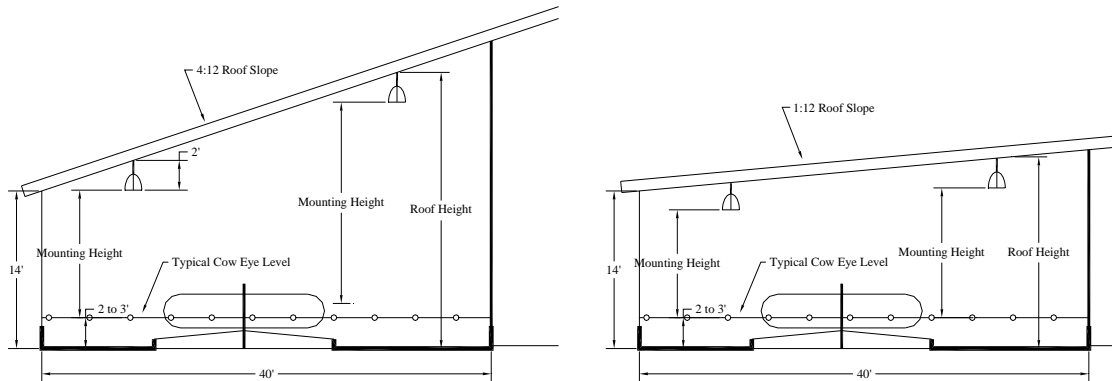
Impact of Roof Slope on Mounting Height in Dairy Housing
